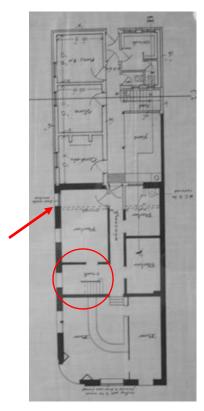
143–143a George Street, alterations undertaken in 1913, Ground Floor Plan.
